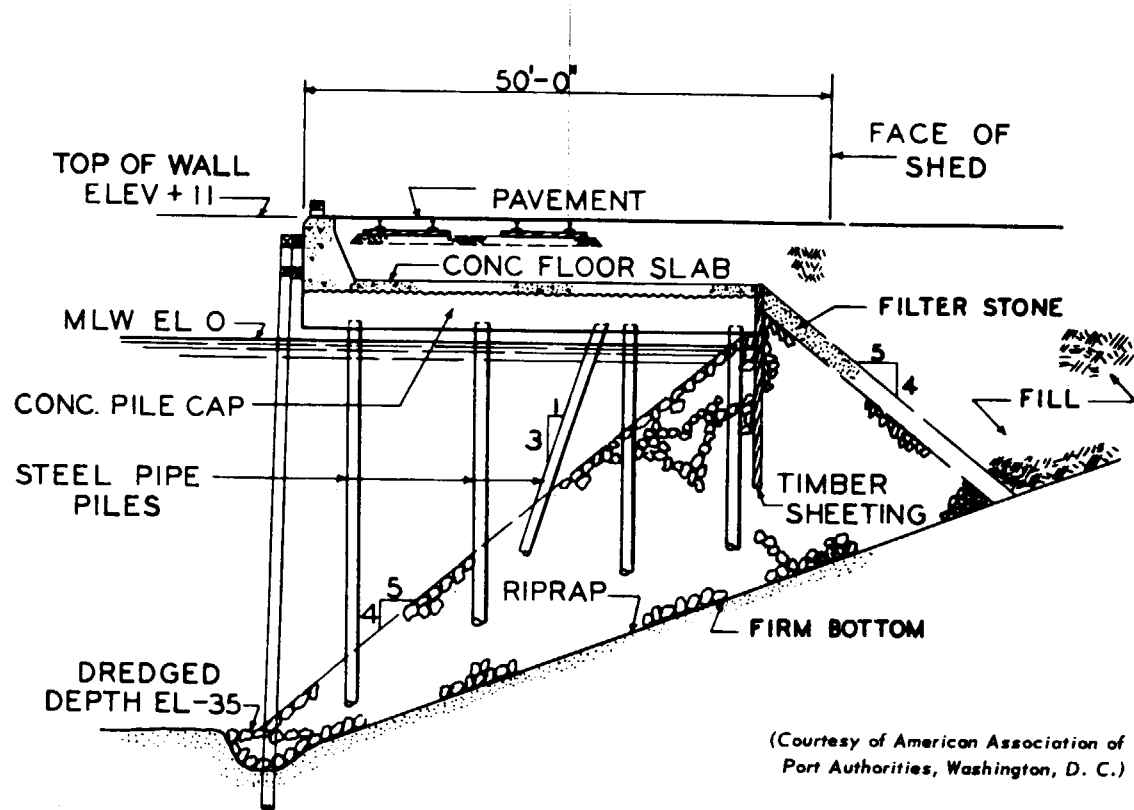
Open-Type Wharf Construction with Concrete Relieving Platform on Steel Pipe Piles.
